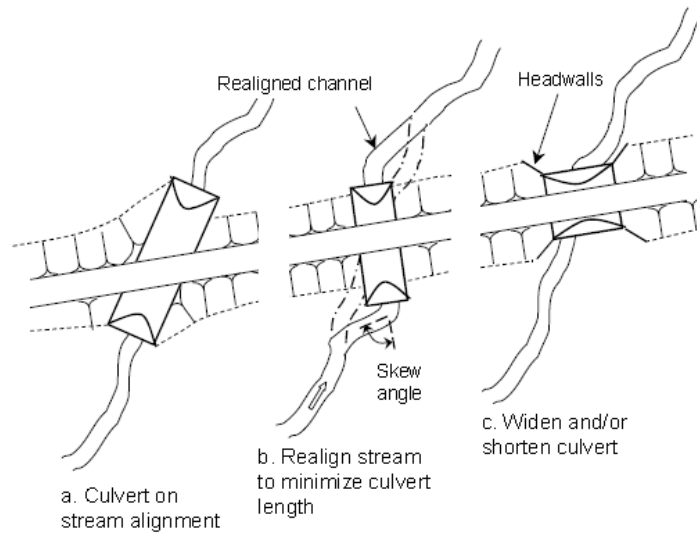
Alignment Options for Skewed Culvert (Bates and Kirn, 2009)
